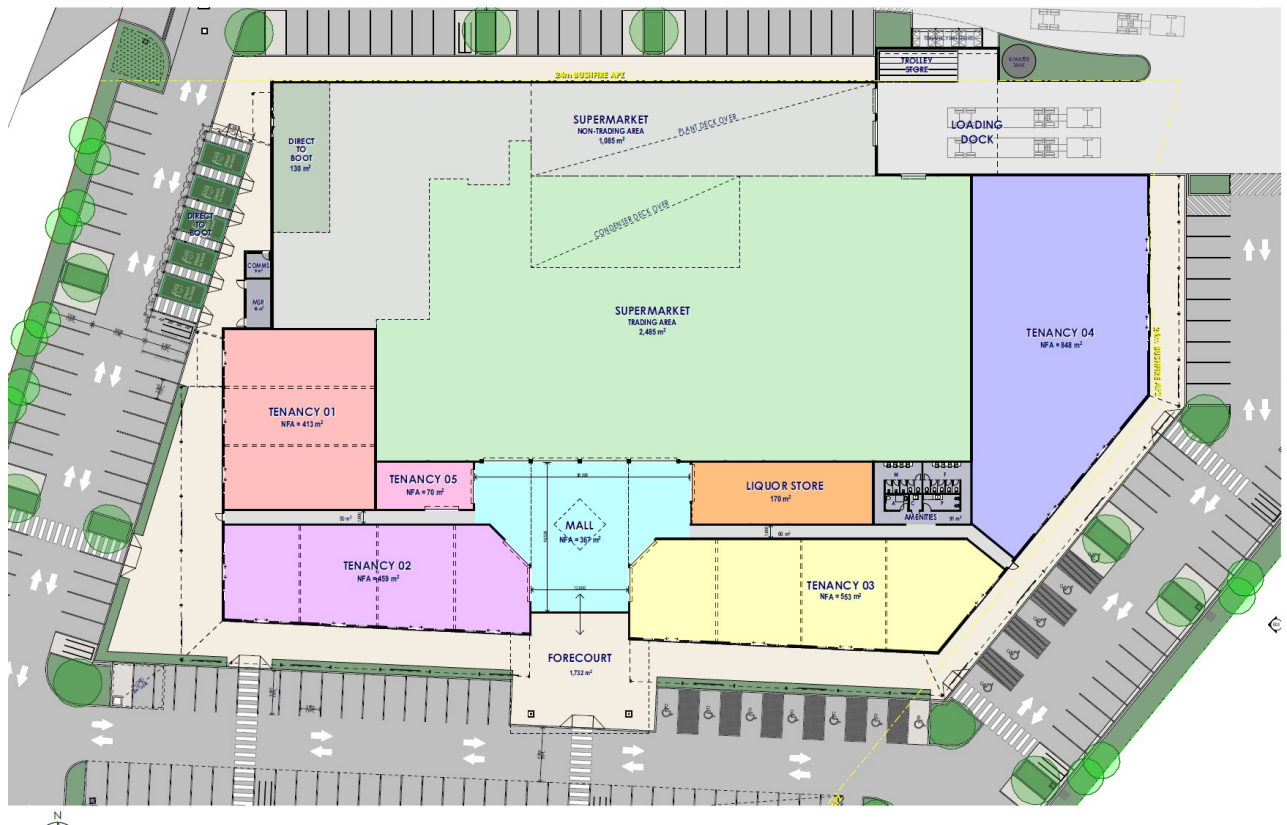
Ground Floor Plan (Source: Monteath & Powys)
